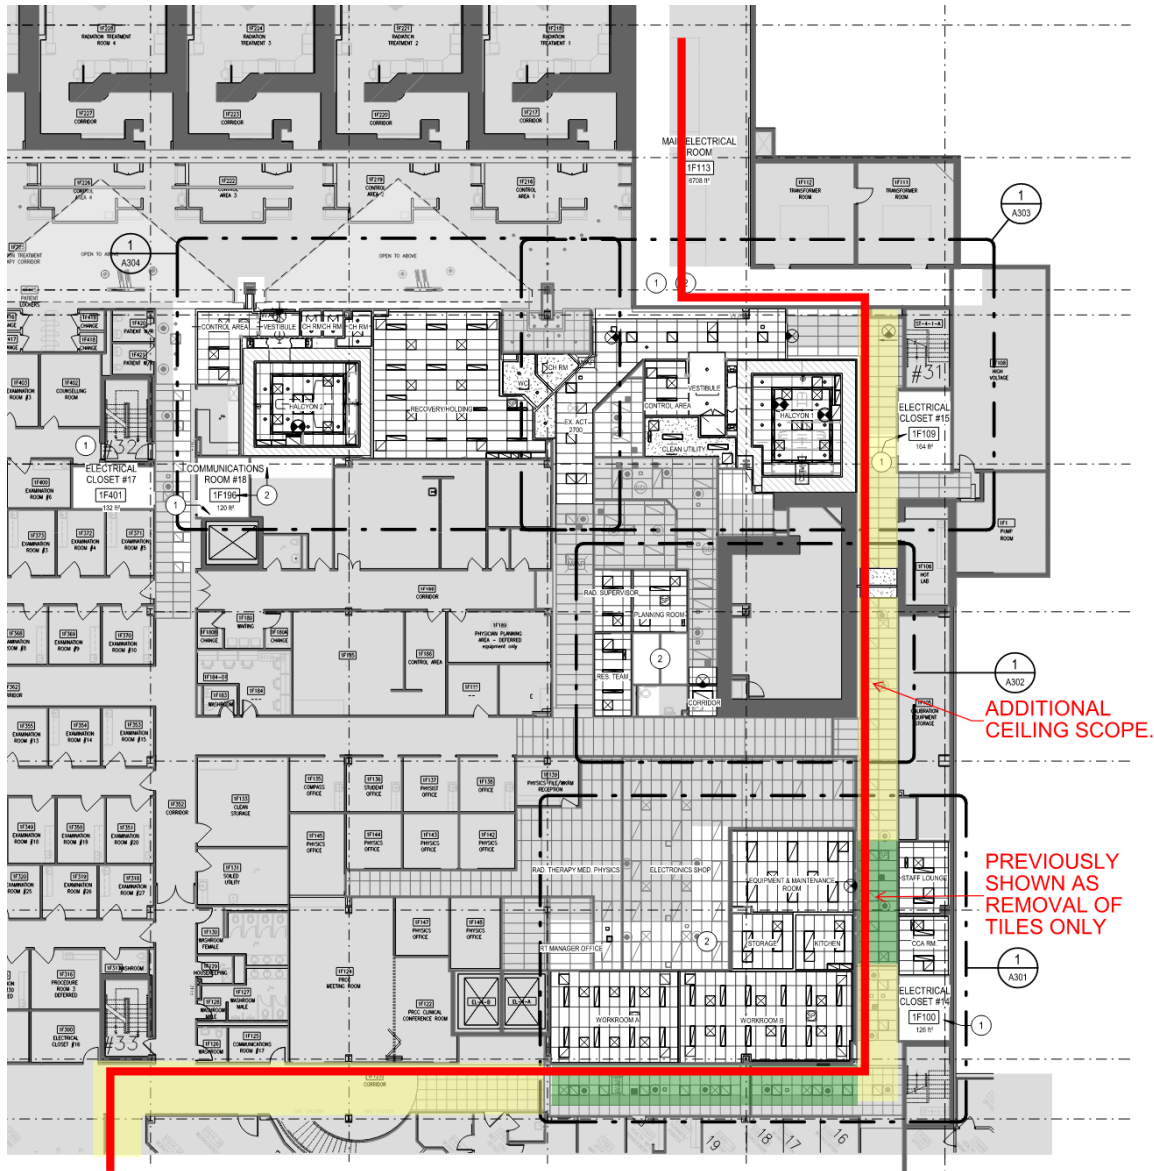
Corridor 1F123 Additional Architectural Ceiling Scope
